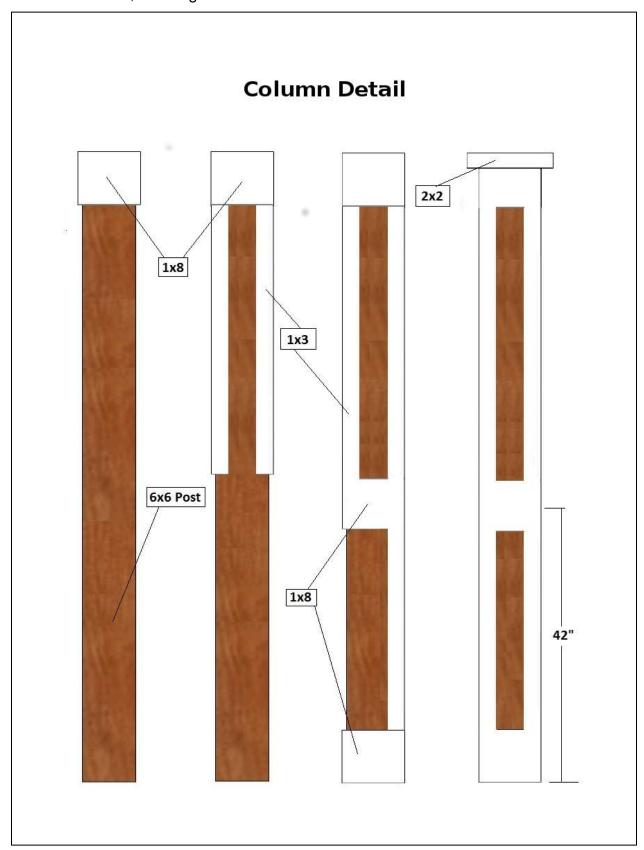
Drawing showing alterations to existing pressure treated structural posts to add architectural details to achieve greater compatibility with the West Woodfield HCD.
